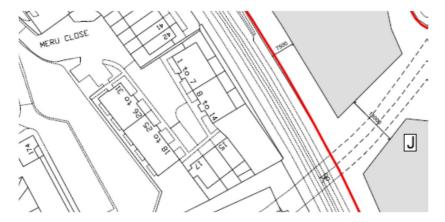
Extract from site location plan by Studio Egret West. The proposed development is to the right.
